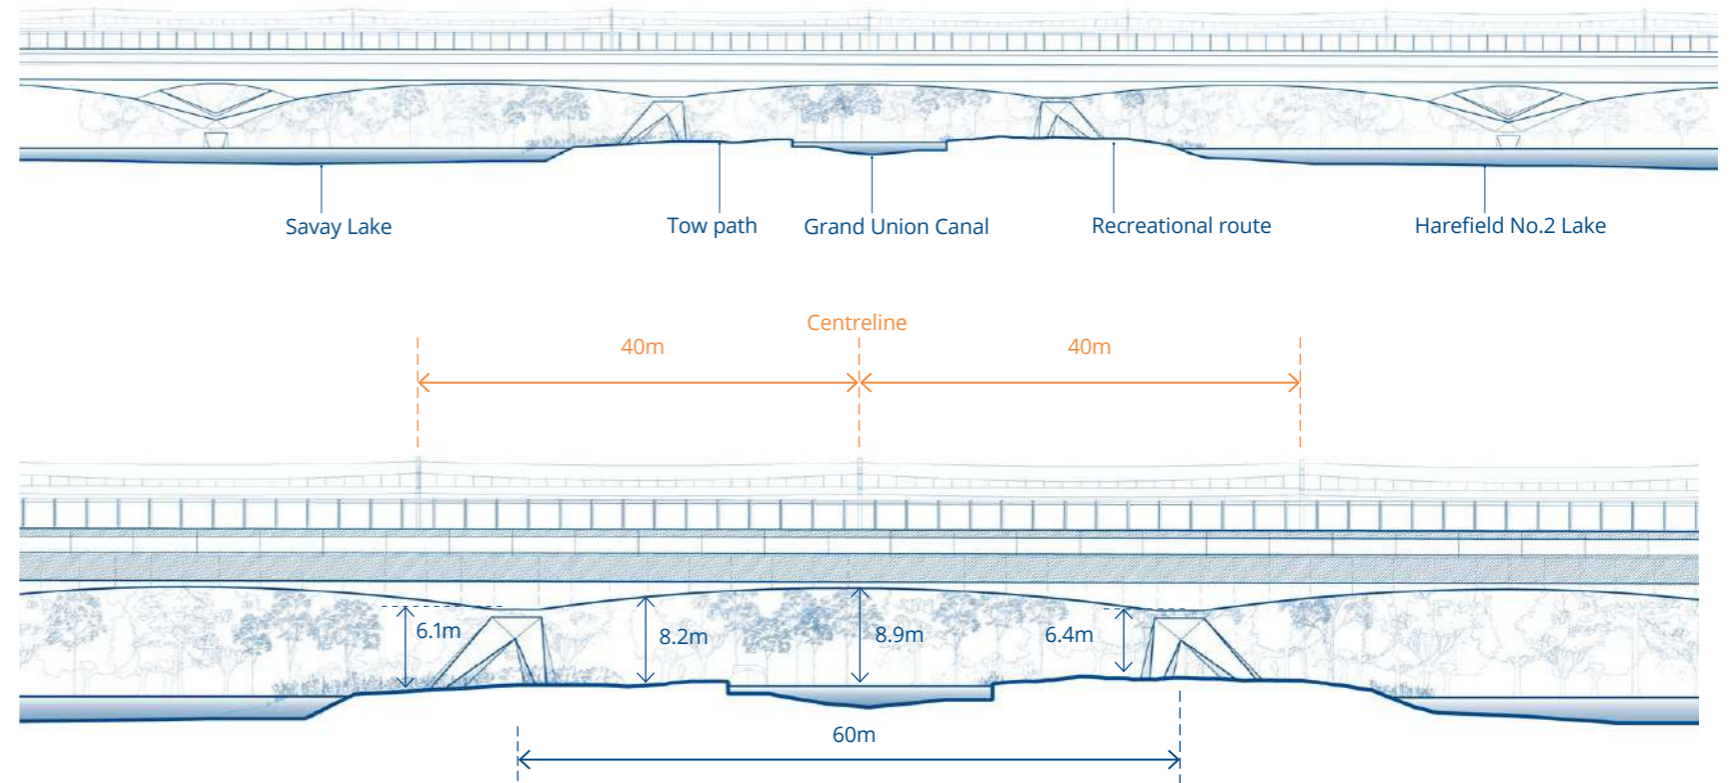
\_ Proposed south elevations - Grand Union Canal crossing
